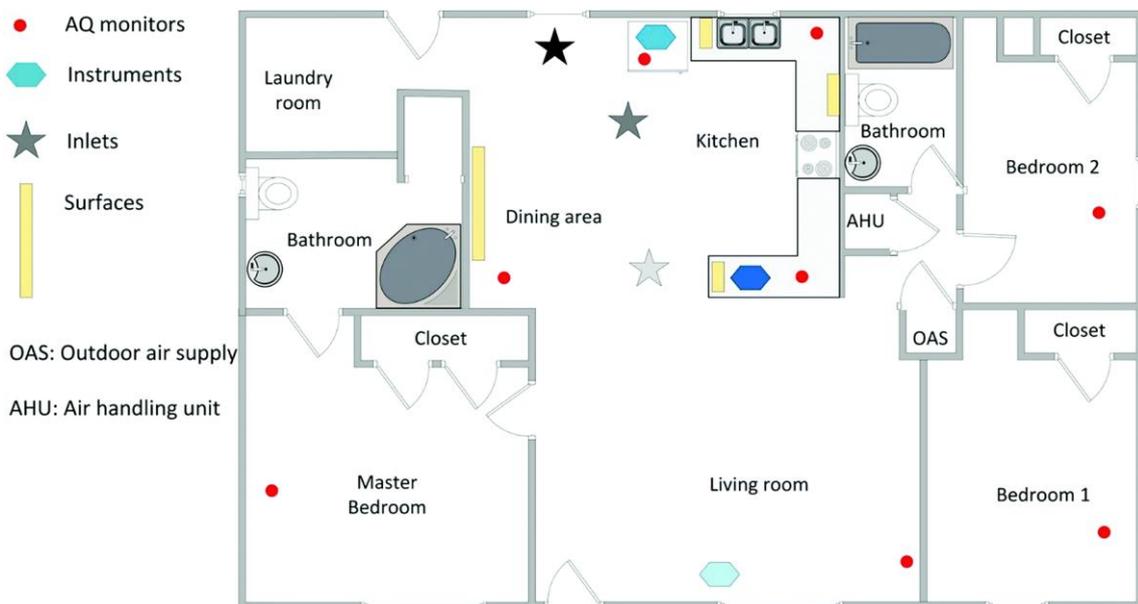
Floor plan of the test house with instruments from published peer-review paper. Source: (Farmer et al. 2019)
